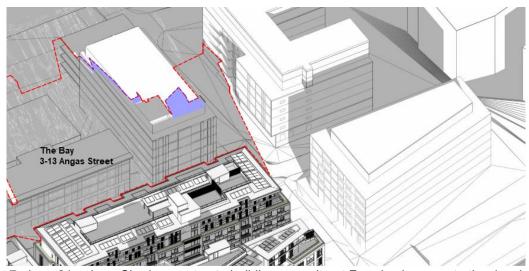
June 21 – 2pm. Shadow cast onto building opposite at Faraday Lane, onto the development known as The Bay (3-13 Angas Street). The purple outline is the additional shadow cast from the
